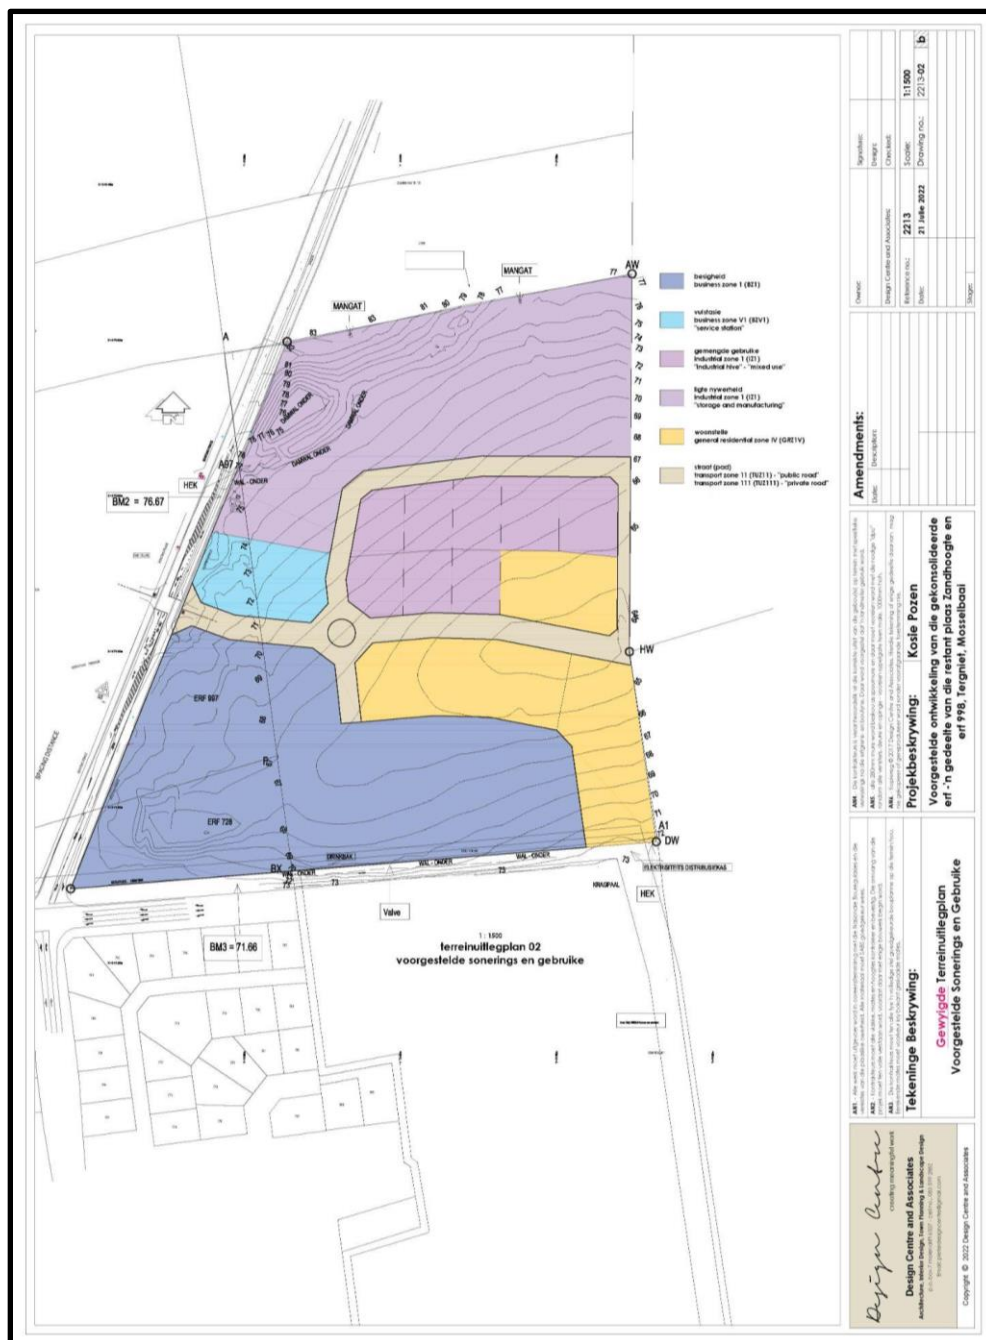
Proposed site development plan (SDP), alternative A, for Erf 998, Tergniet and the Farm Zandhoogte no. 139.
